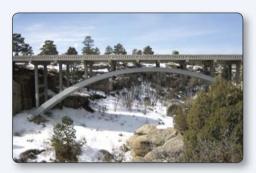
This deck arch completely spans the canyon floor and is highly transparent. The bridge and the site are complementary. State Highway 83 Bridge over Castlewood Canyon, Colorado.
